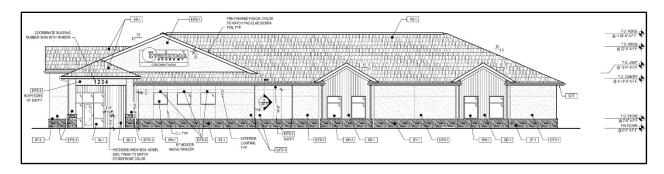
Rendered Character Elevation along Lakeridge Drive, Daycare Facility
